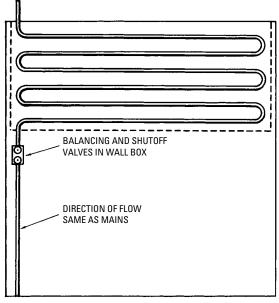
Typical wall installation. Panel is installed on wall as high as possible.
